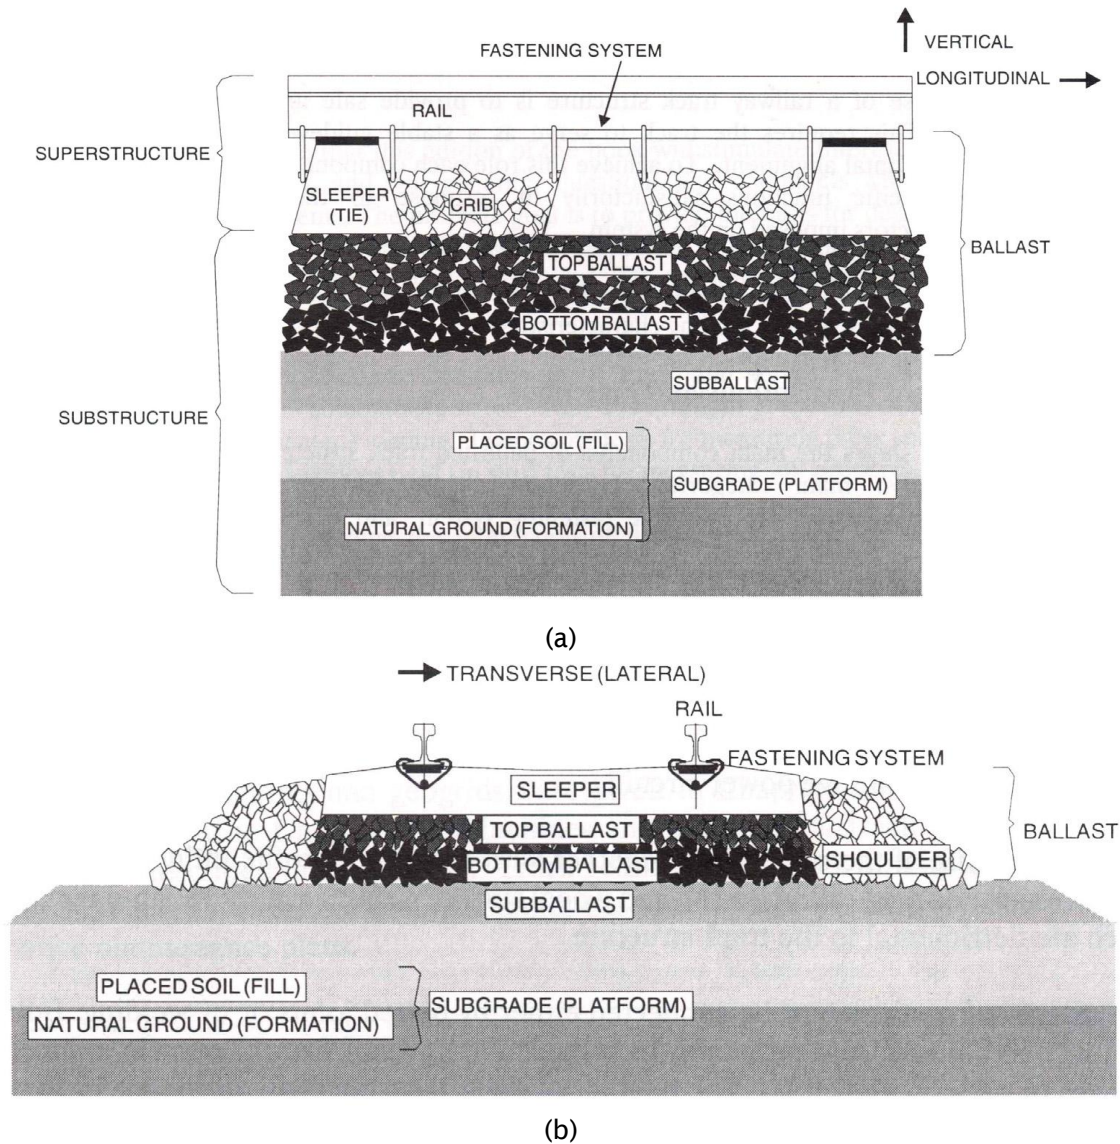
Layout of a typical ballasted track (a) Longitudinal view; (b) Transverse view
